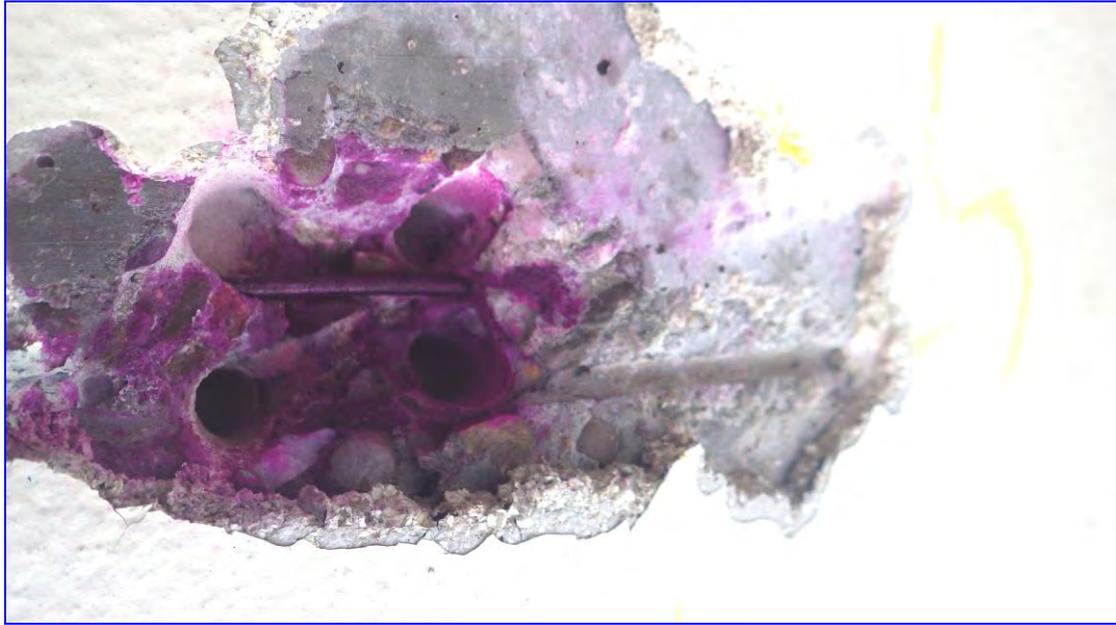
The breakout at TA22, roof beam (external) revealing clean and passive reinforcement in alkaline concrete.
